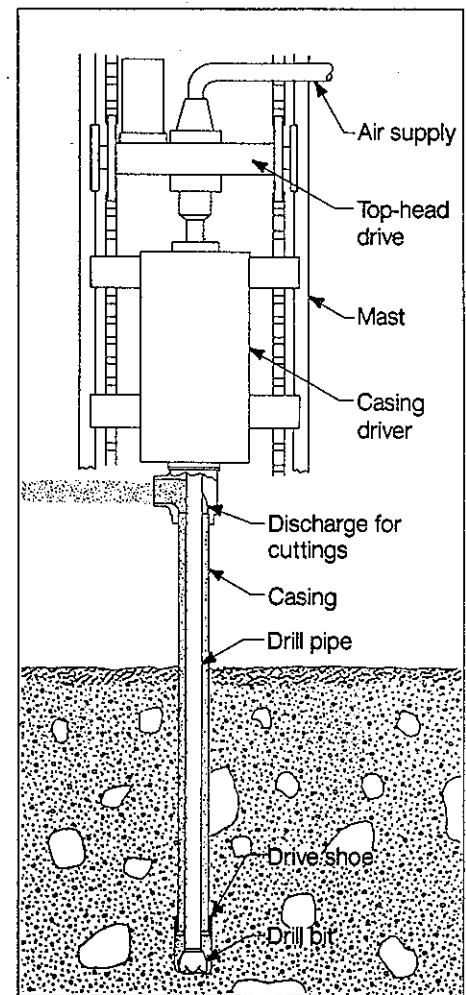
Casing drivers can be fitted to top-head drive rotary rigs to simultaneously drill and drive casing. (Wellen Drill Tools, Inc.)
